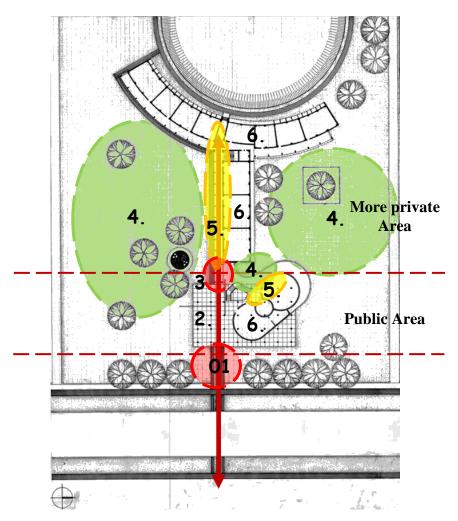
Ground floor Plan: replication of Bengal household patterns and sequences (Archive, n.d.)
